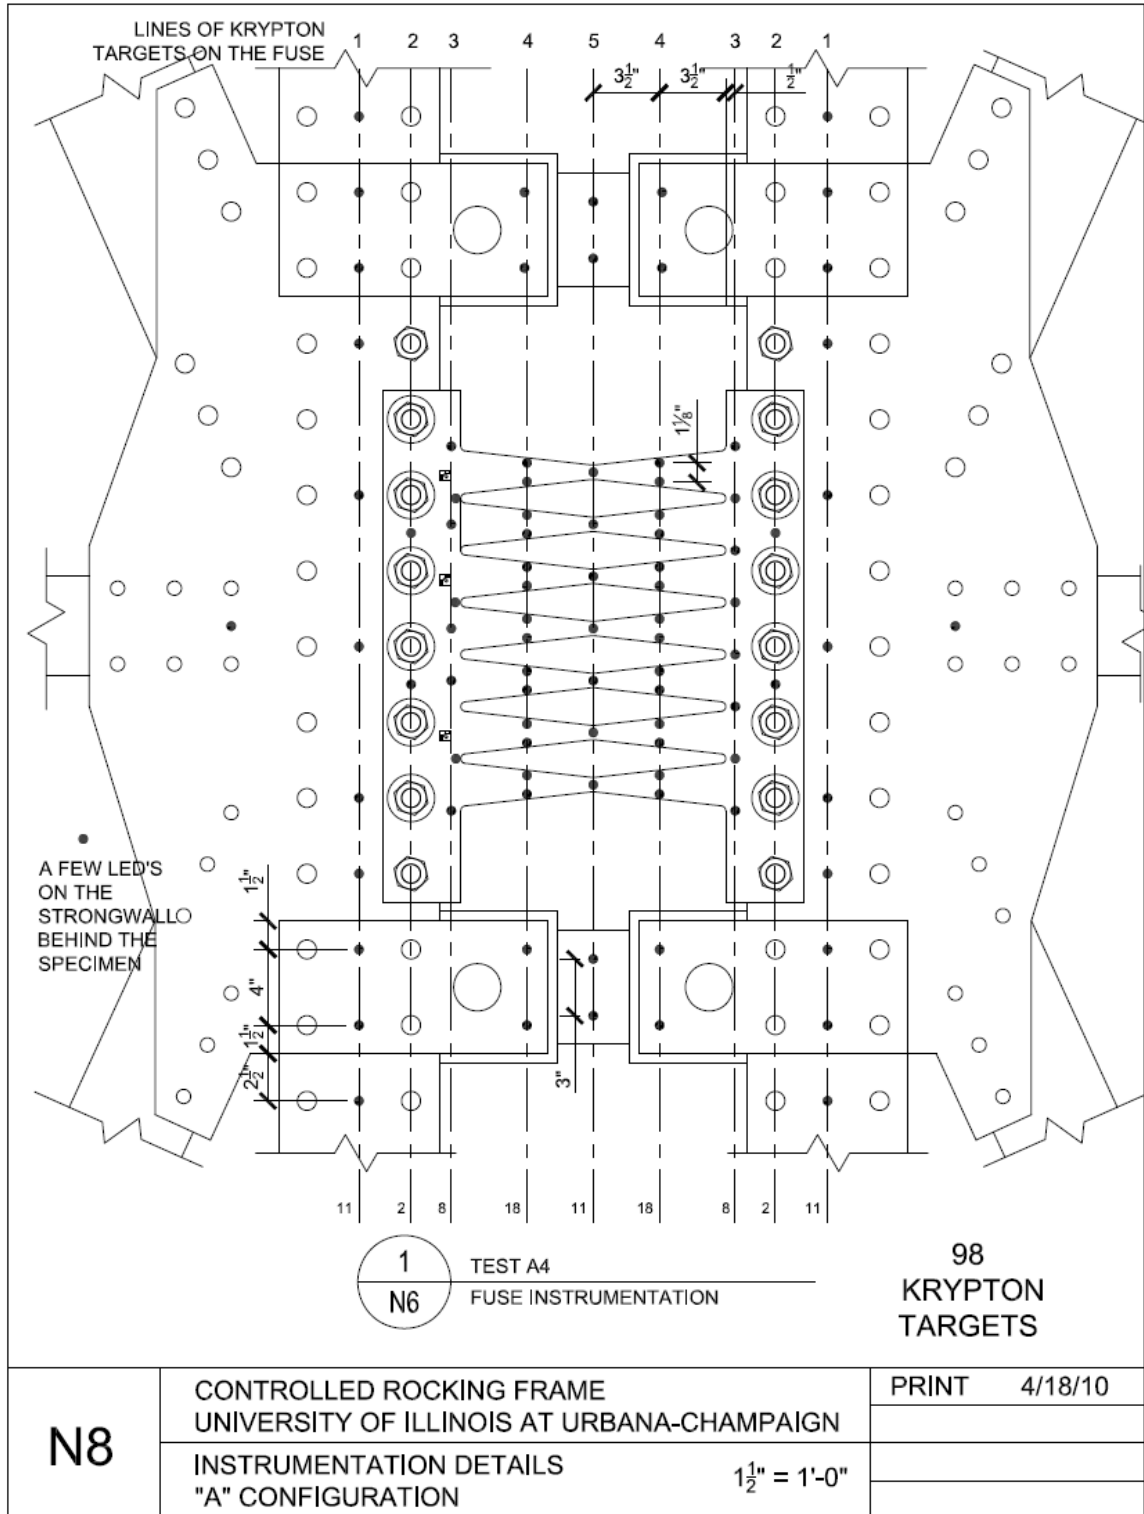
Instrumentation Plan Drawing – Krypton LED’s for Specimen A4
